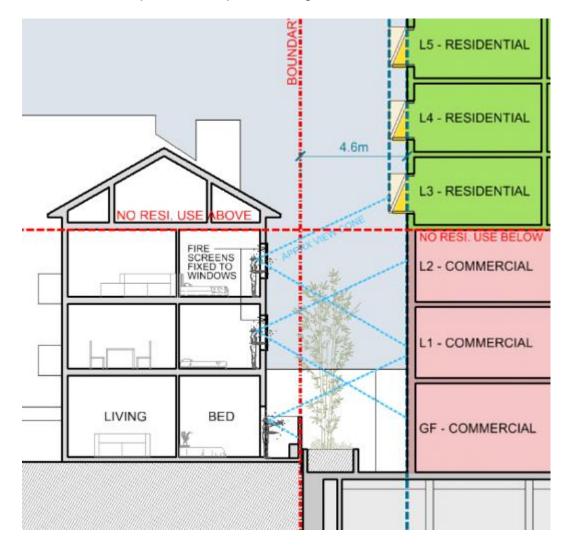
Plan extract showing the overall spatial relationship and juxtaposition of the proposed development to the residential flat building at No. 29 Victoria Parade
